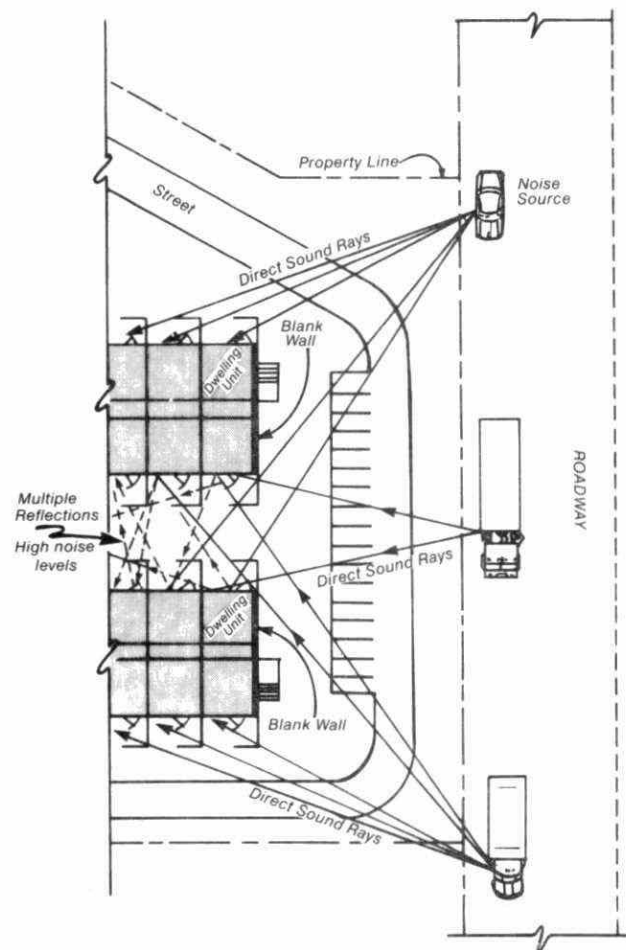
INEFFECTIVE USE OF BLANK WALLS
